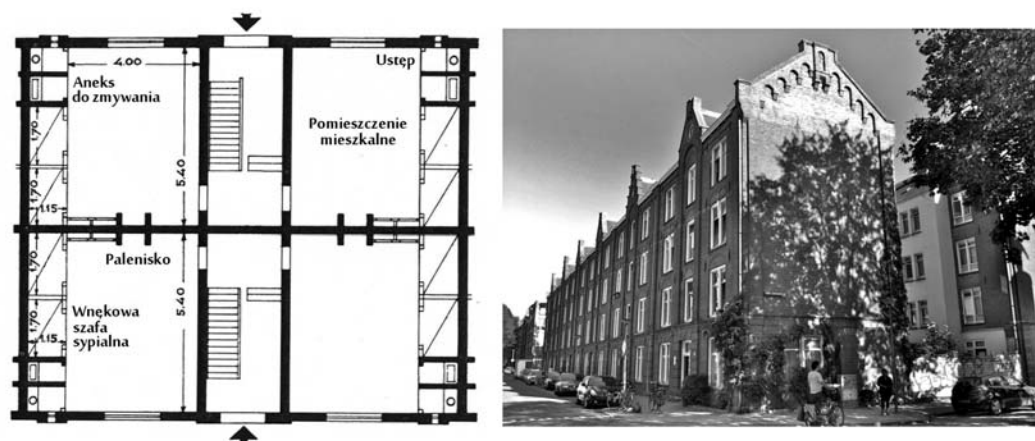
Amsterdam. „Back to back” building. Projection of the ground floor – on the left (Marnixstraat) and building D – on the right (Blankenstraat 2-12, B. de Greef, 1878–1881). Source: [10, p. 29 (on the left), 2 (on the right)]
